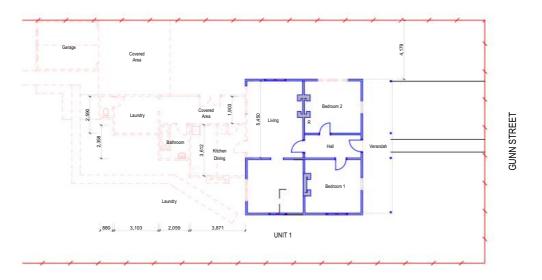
Proposed Demolition Plan. Source: The writer/ carste STUDIO
